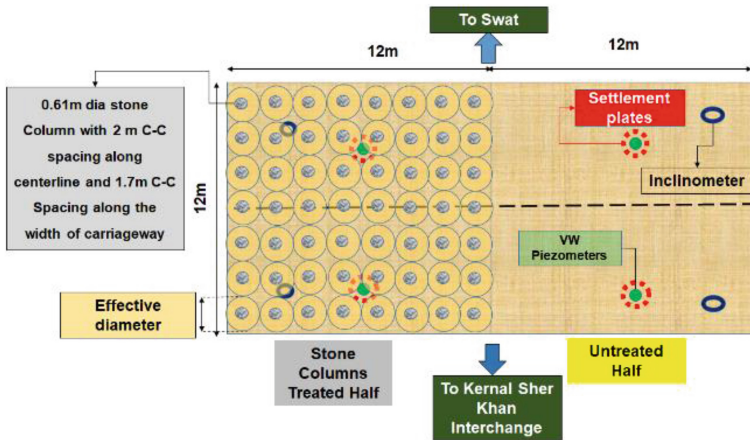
Instruments layout plan of trial section Swat Motorway-top view
